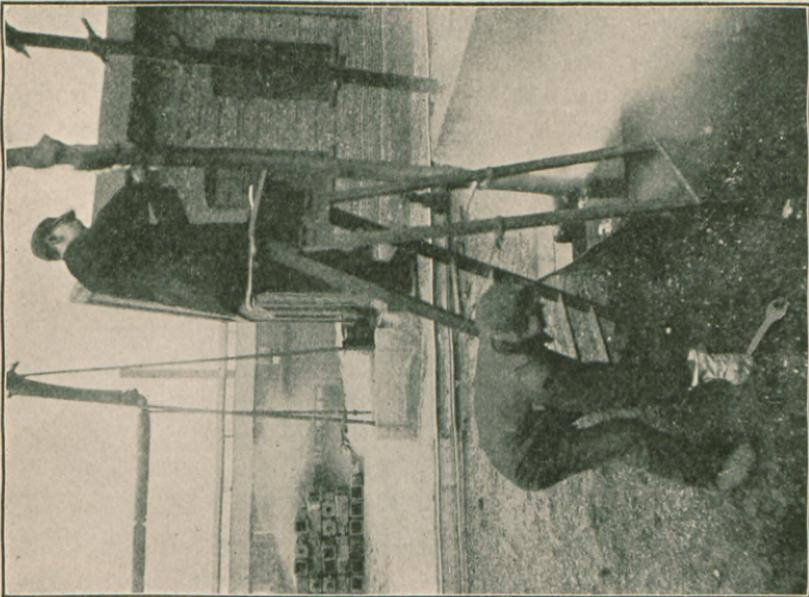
Workman places wrench carelessly on ladder platform.
